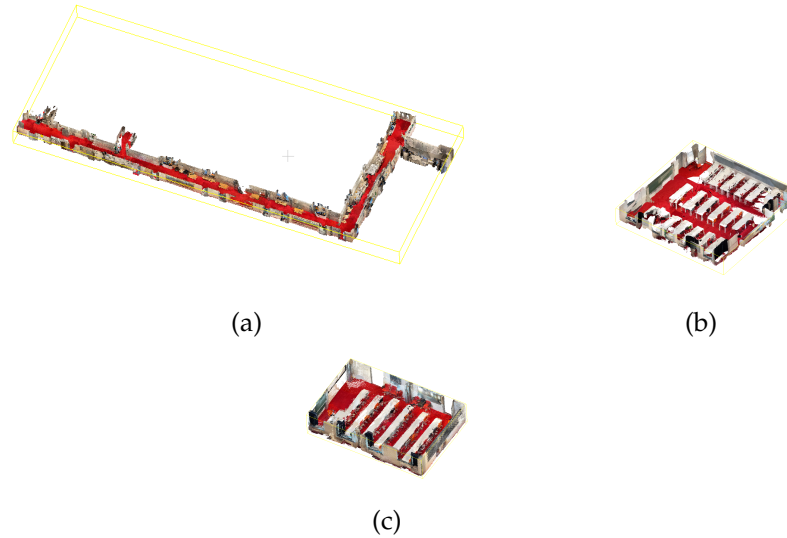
Post-processed scans with aligned bounding boxes of rooms and hallways of 1st floor of the East wing of the Architecture faculty (a) Hallway with coffee corner (b) Room C (c) Room U (own images)
